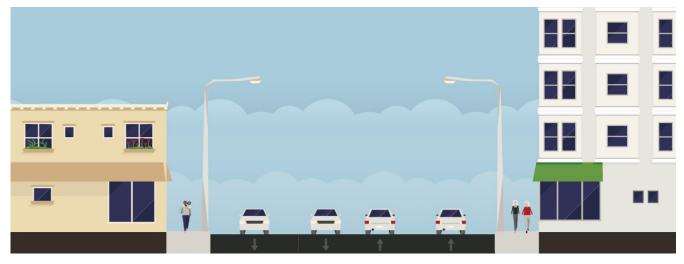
Jasper Avenue Facing East (West of 121 Street)
